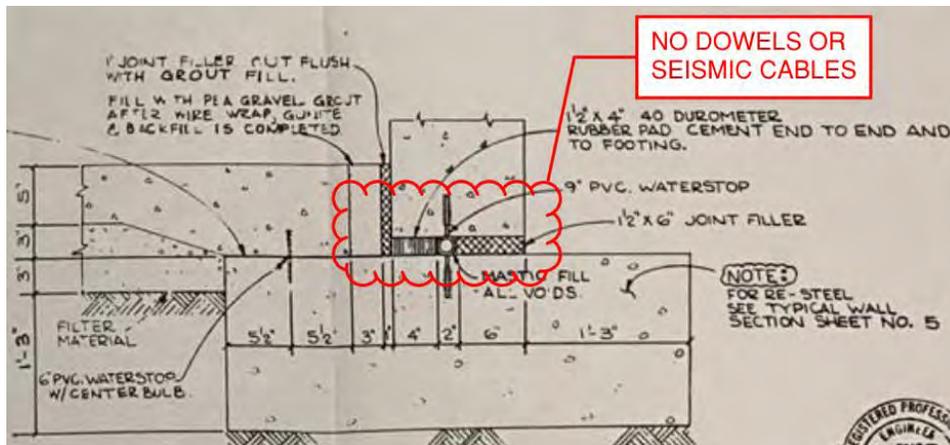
Base of Wall to Foundation Connection without Dowels or Seismic Cables
